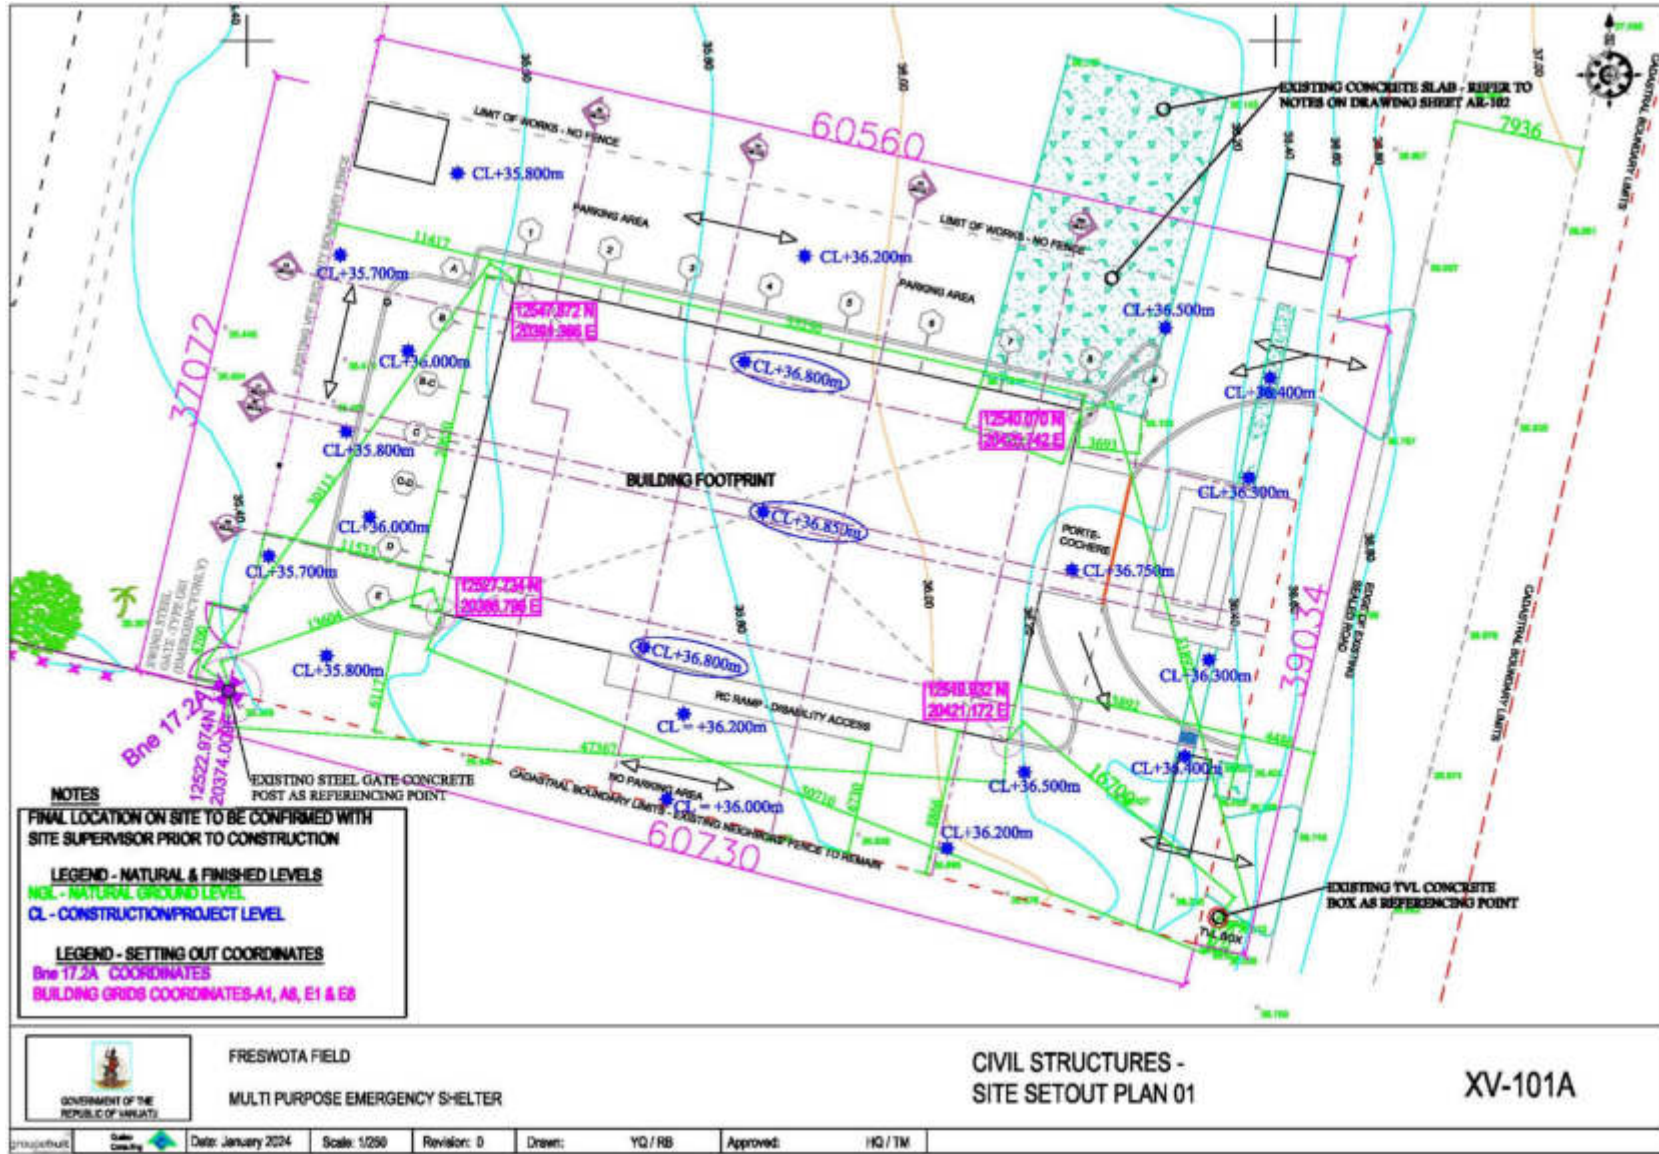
Freswota Field – Civil structure site setout plan showing the main elevation of the construction
